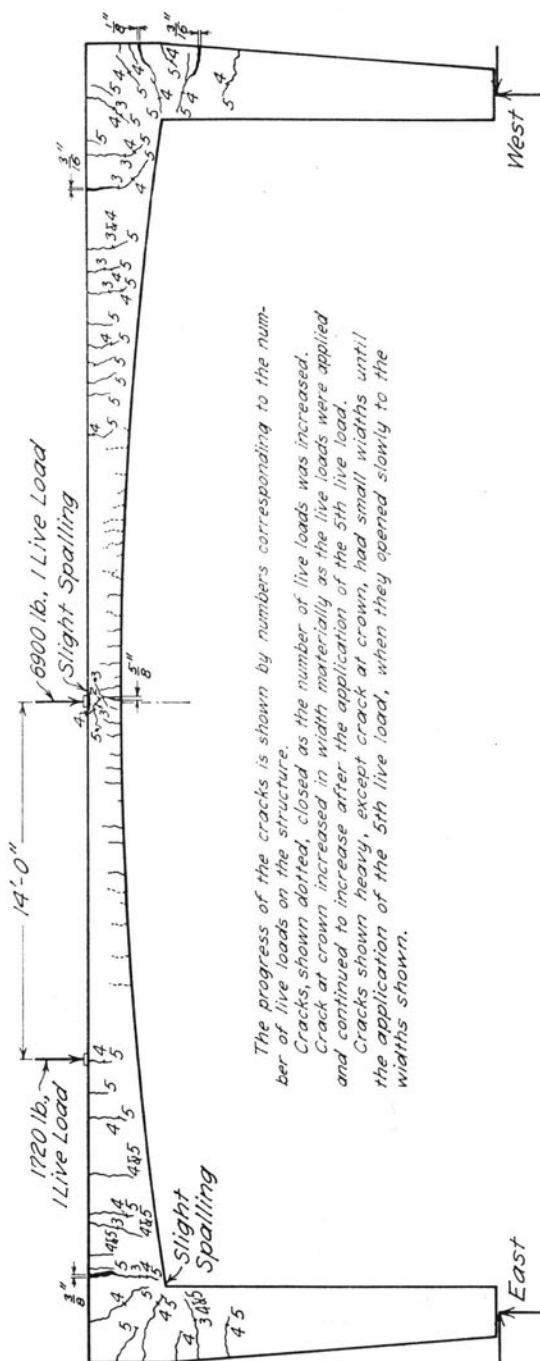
CRACKS IN SPECIMEN 2; CAPACITY TEST
